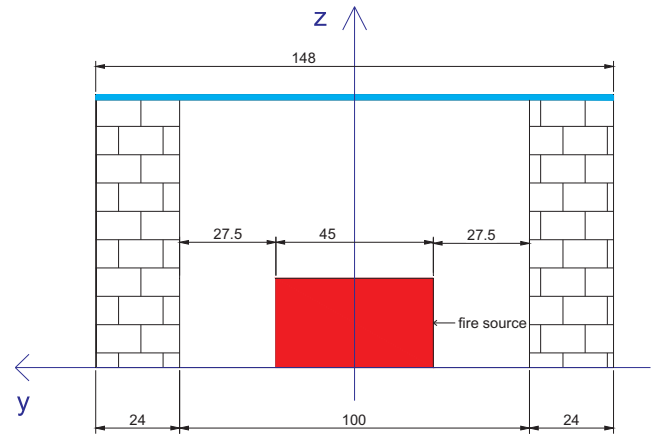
The cross section of the model tunnel (unit: cm; scale ratio: 1:10).
